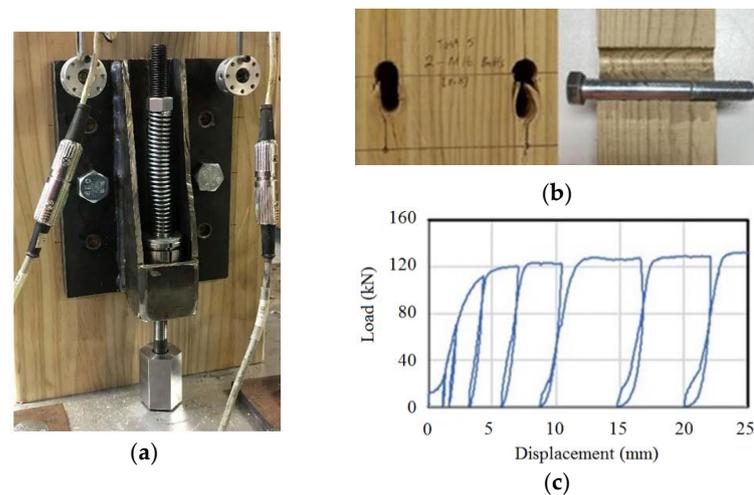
Dowelled slotted-in steel plates: (a) HD test setup; (b) ductile steel yielding and wood crushing failure modes (photo credit: (a,b) Justin Brown; (c) Fast + Epp, reprinted with permission).
